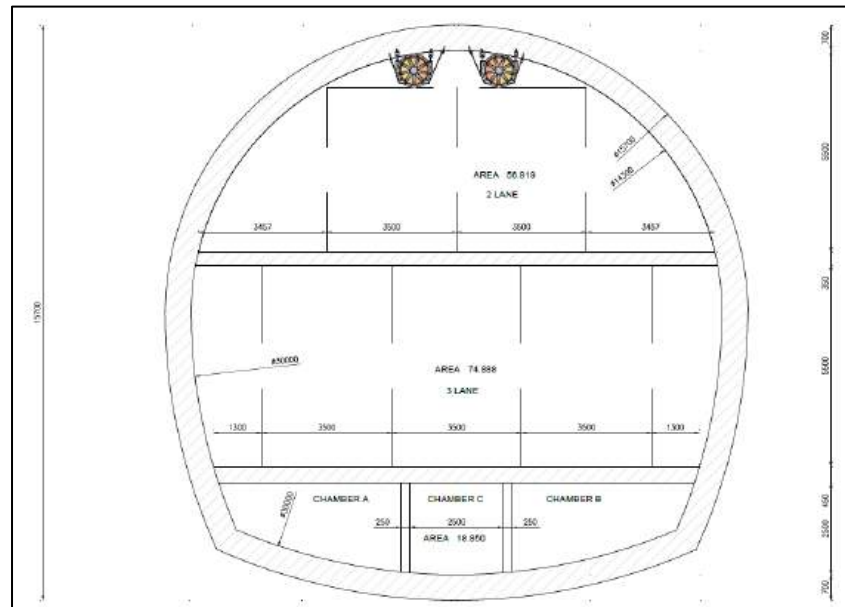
5-Lane Modified Horse Shoe Tunnel Typical Cross Section
